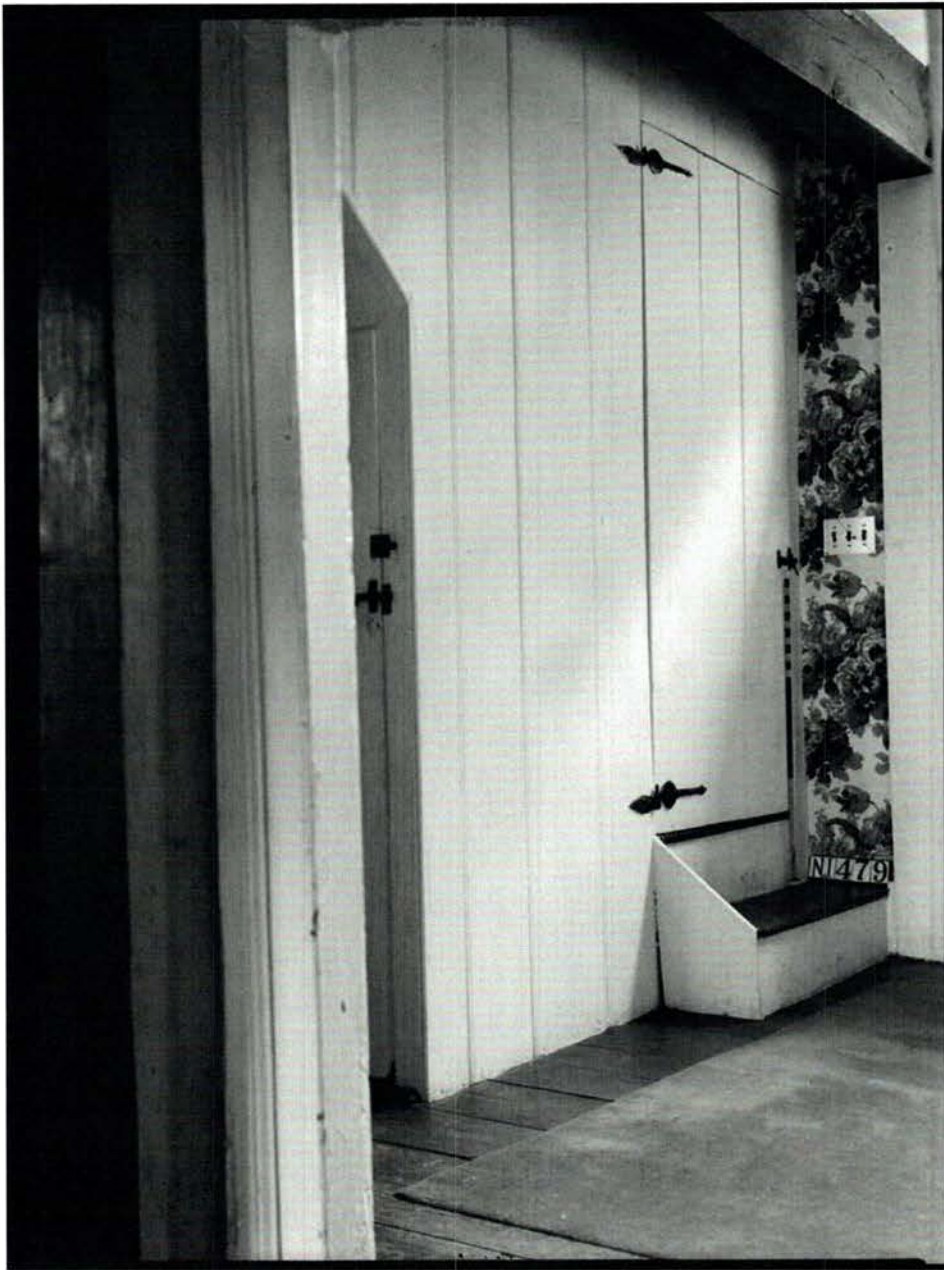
Van Wickle House, north entry hall (Room 101) and staircase, 1938 [HABS, NJ-479]
